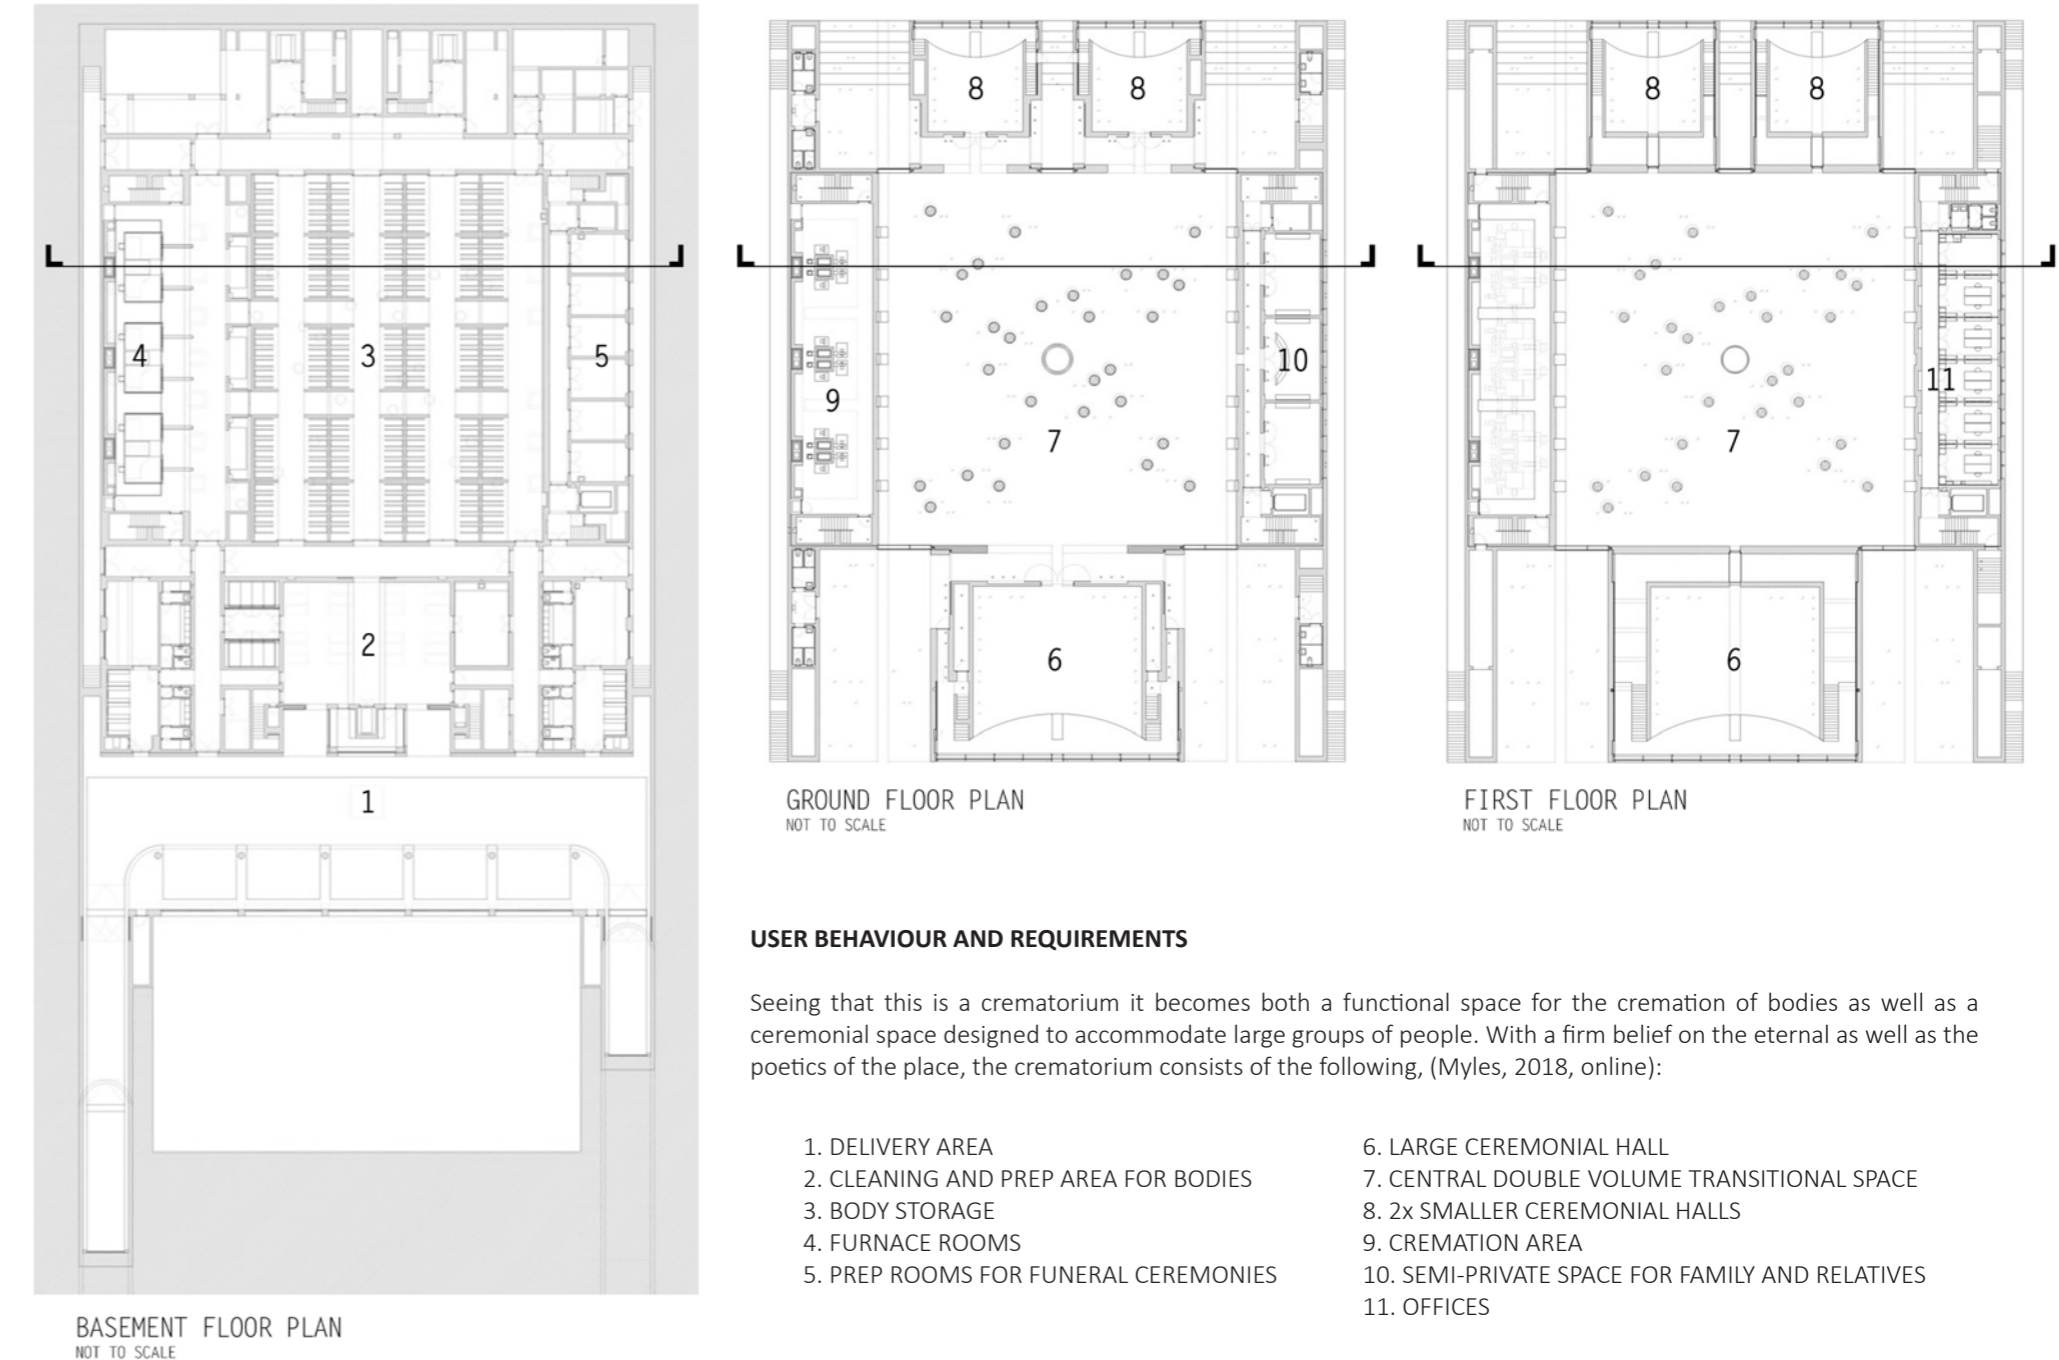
Crematorium Floor plans, (Adapted by author, 2020)
